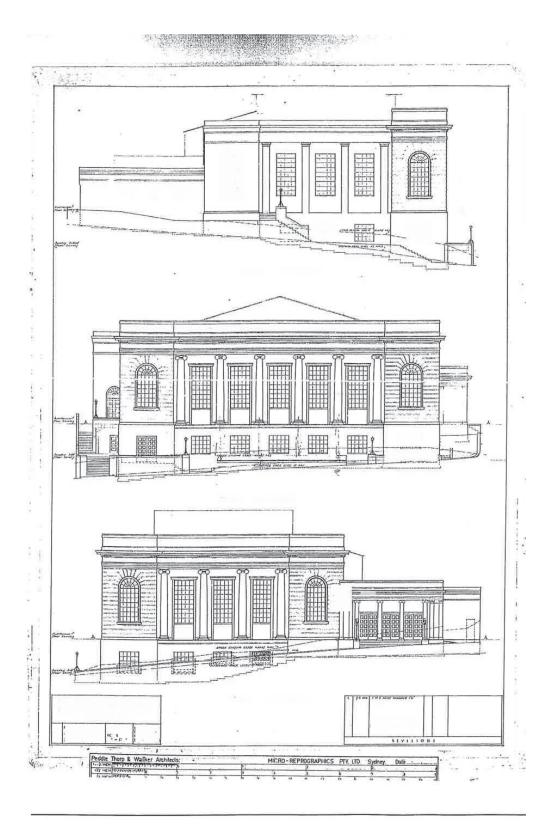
Elevations, 1926 (Source: Conservation Plan 2000)
